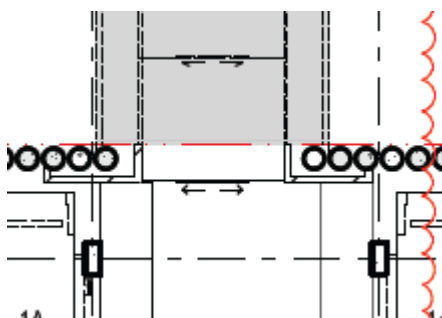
Proposed door at the junction of Building 2 and the travelator tunnel
